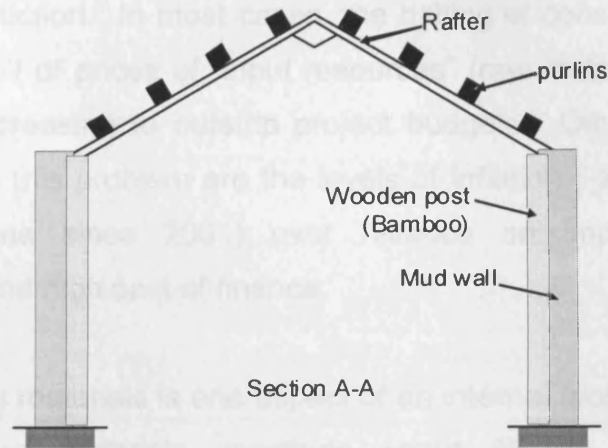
Typical building plan for rural dwelling unit in Ghana
